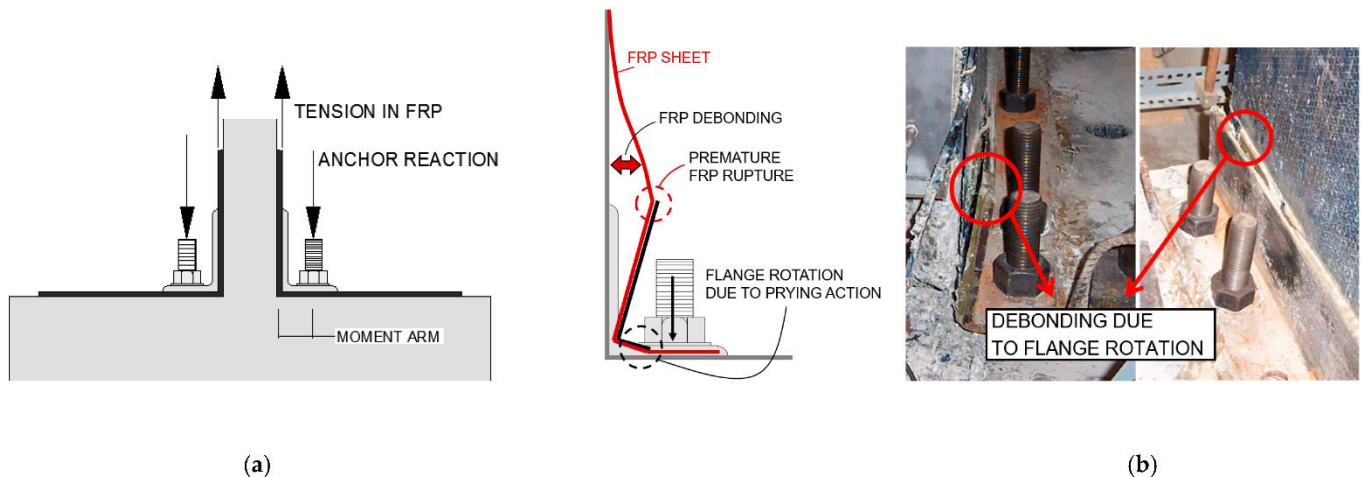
Failure mechanism of steel angle anchor system; (a) Prying action; (b) Debonding and premature rupture of FRP [19].
